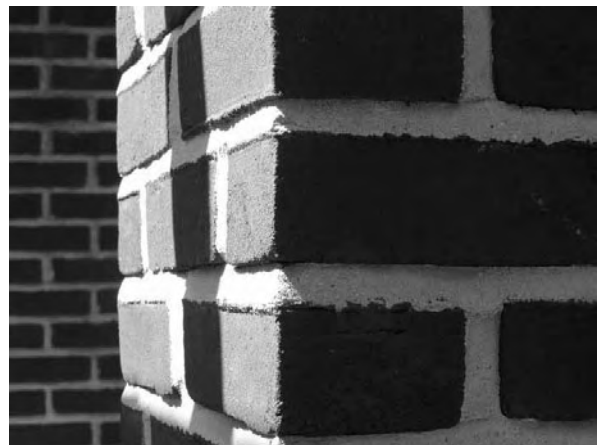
Brick piers with weathered type mortar joints. (Architrave, 2003).
